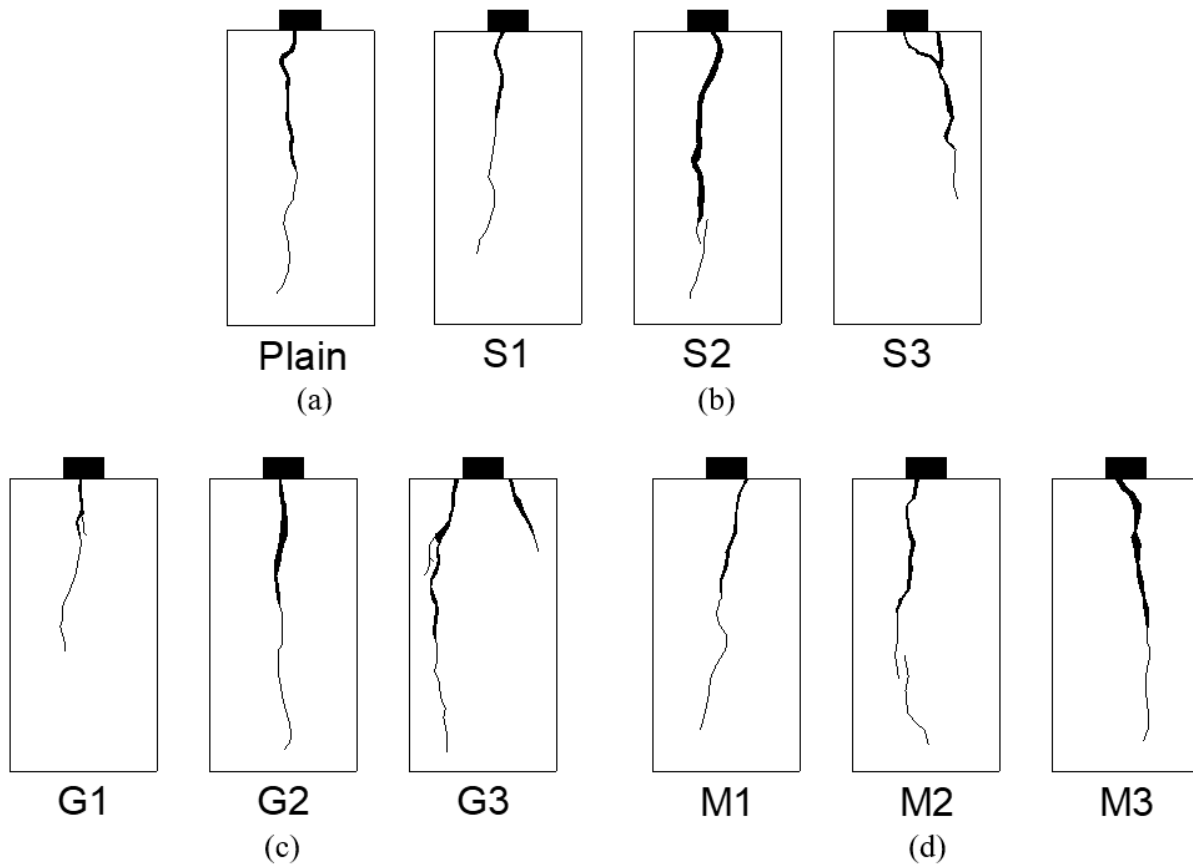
Failure mode: (a) Plain; (b) steel rebars; (c) GFRP rebars; (d) steel meshes
